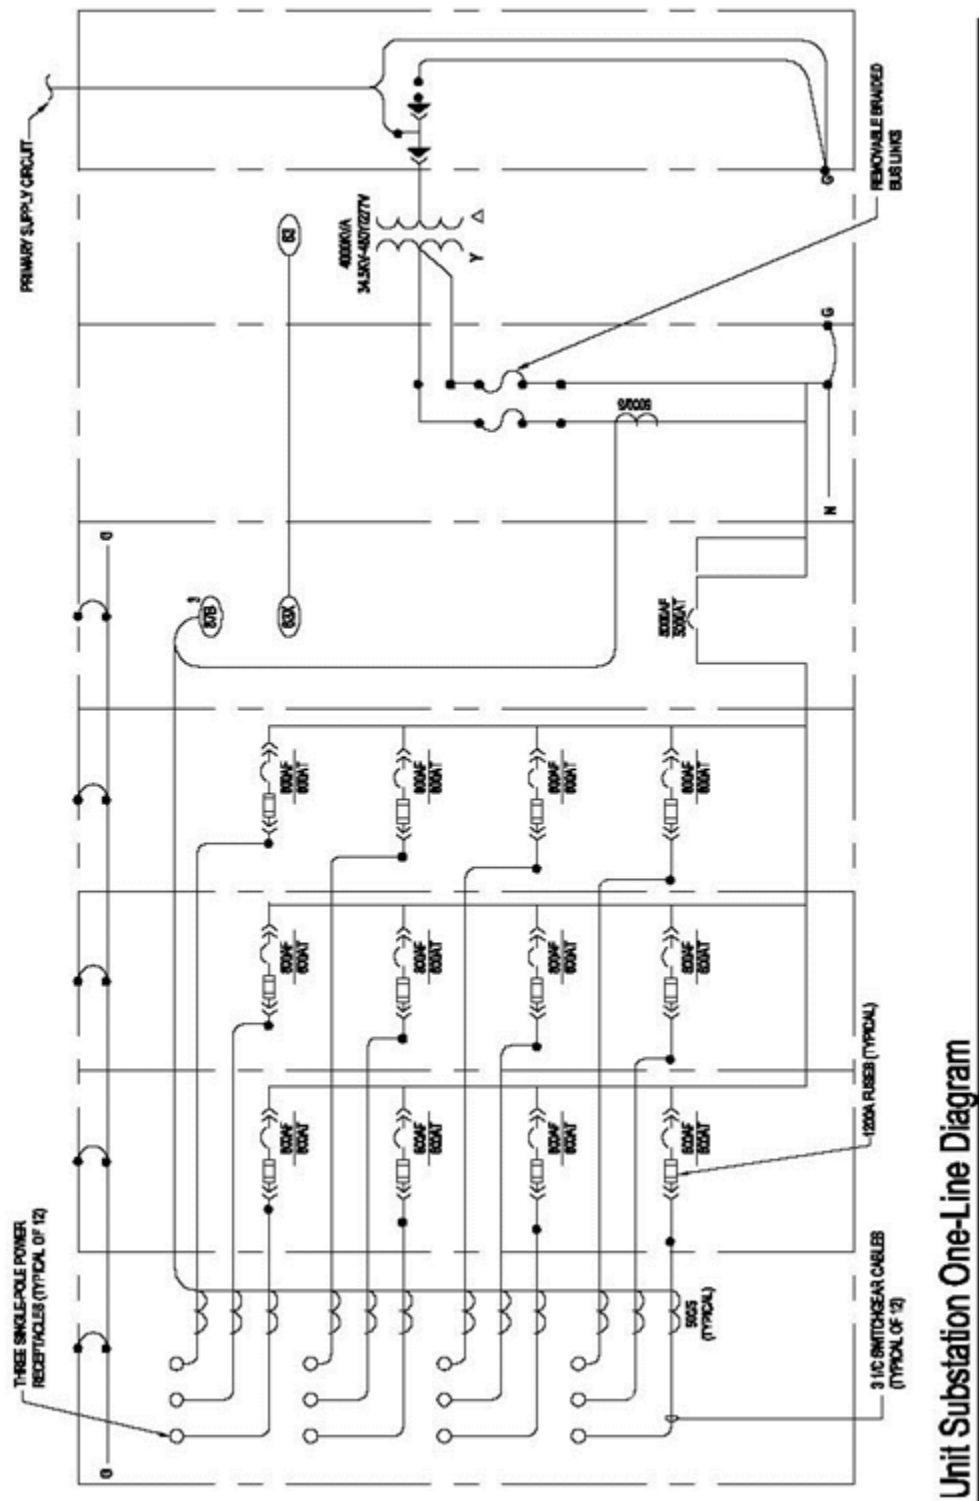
(c) Electrical System for a Double-Deck Pier (3 of 9)
